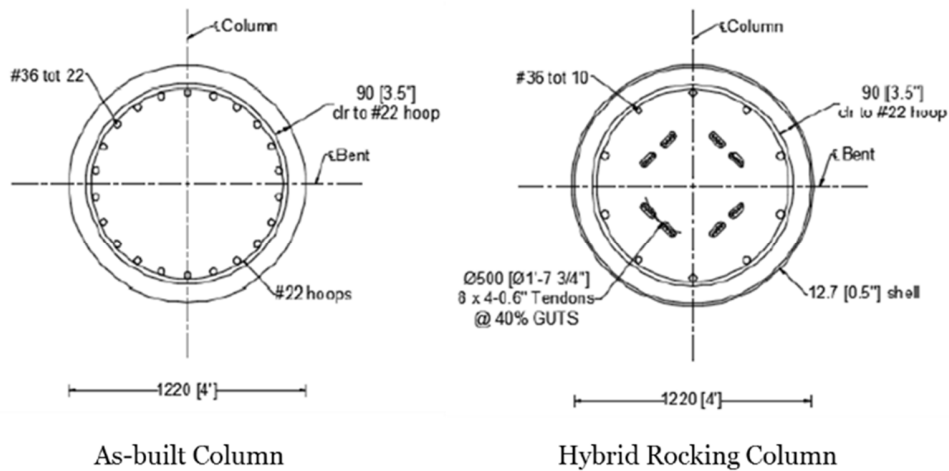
Cross section representation of the as-built column (left) and the re-centering column (right) (Nema, 2020).
